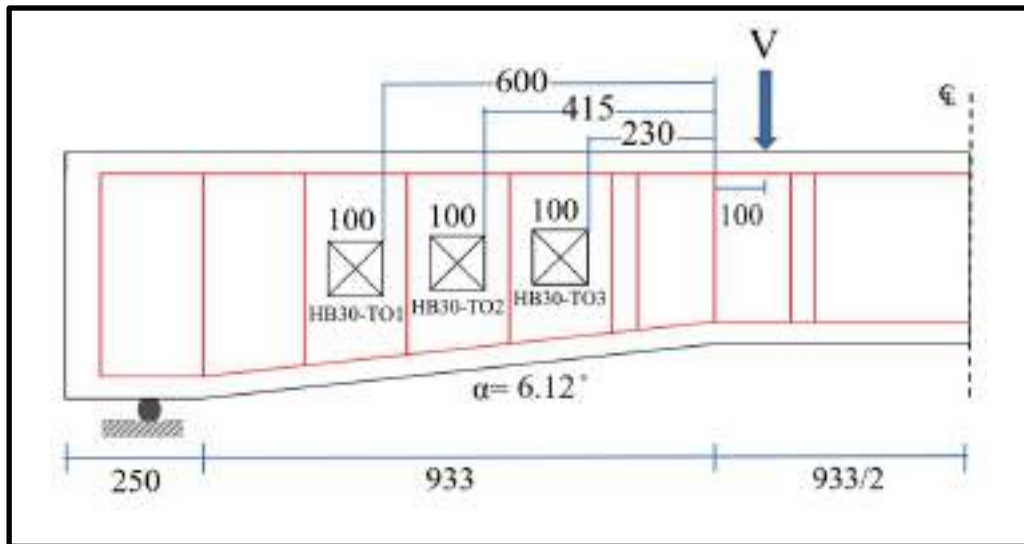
Details of three RCHBs have transverse opening with different positions.
